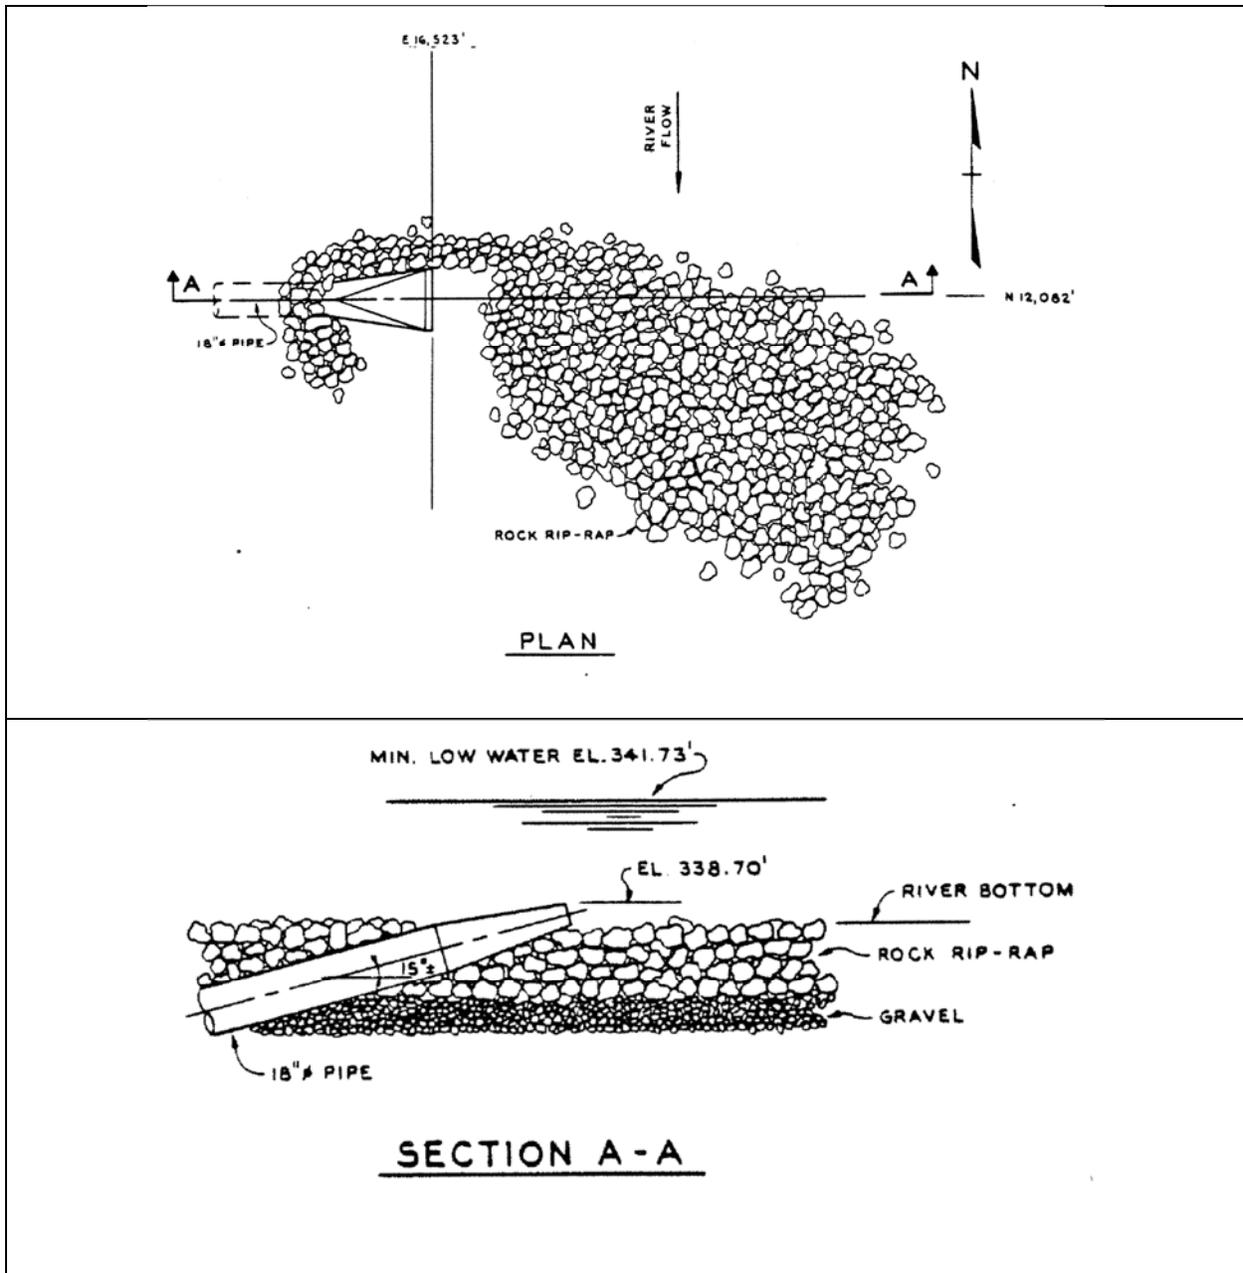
The CGS blowdown wastewater discharge pipe, plan and profile views. Source: NRC (2012b)
